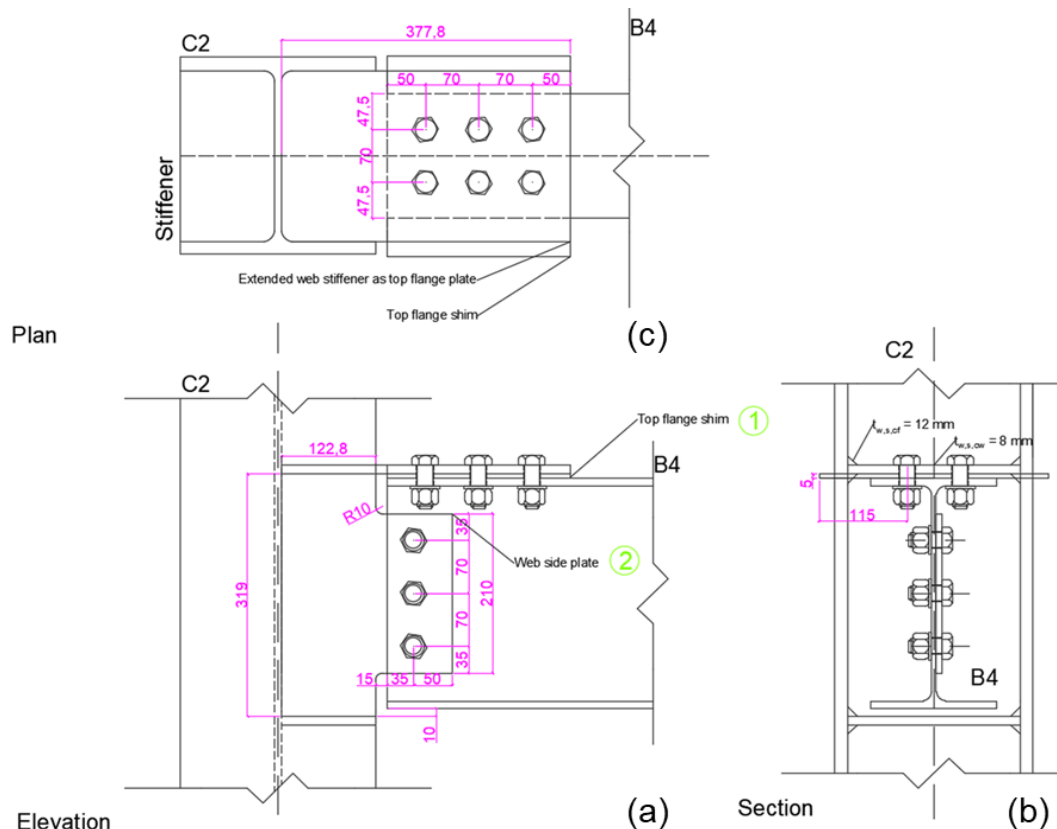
(a) Elevation, (b) Section and (c) Plan View of Weld Side Plate Connection at B4 to C2
